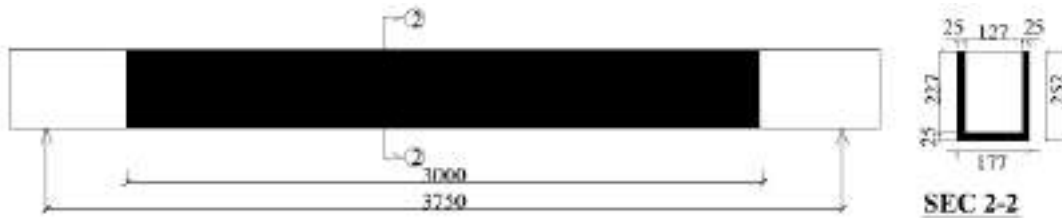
Longitudinal and cross-section of retrofitted beams (Source: Pansal et al., 2006).
